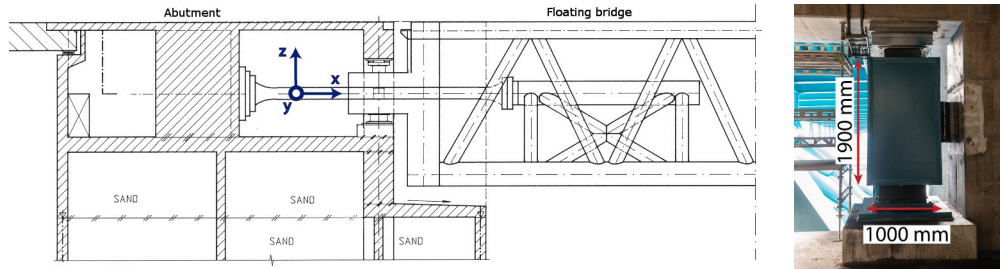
Left: technical drawing of end support; right: neoprene bearing
